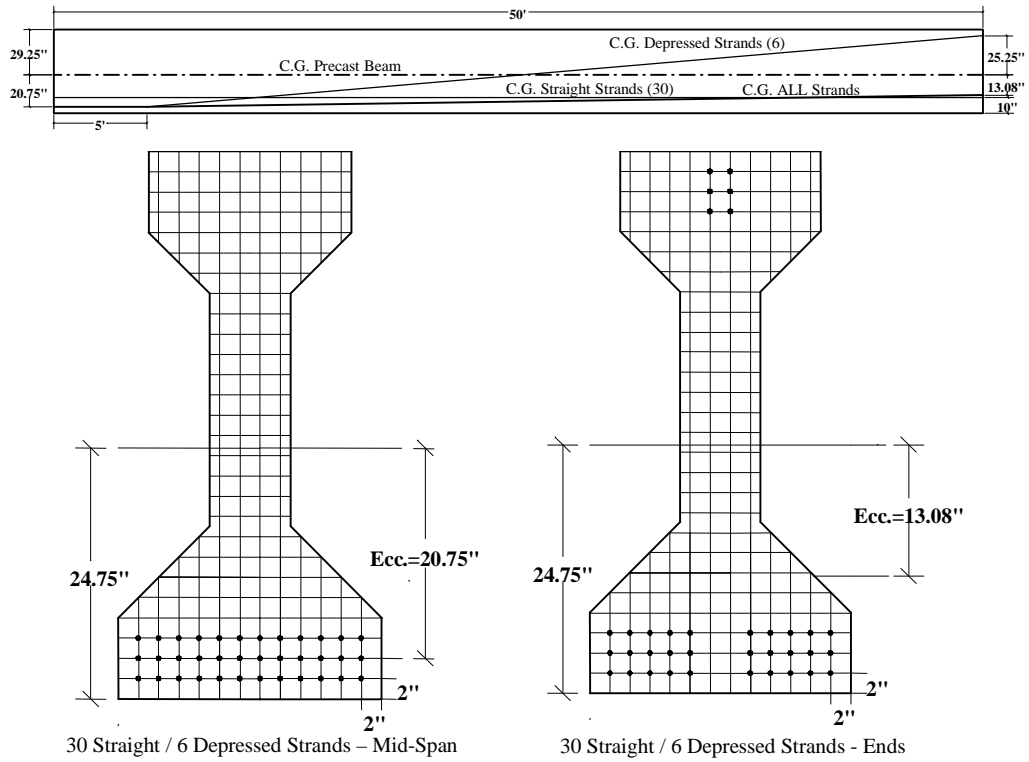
Elevation and Cross Section Views of the Interior Girders, Mid-Span and End Sections, Slaughter Creek Bridge
